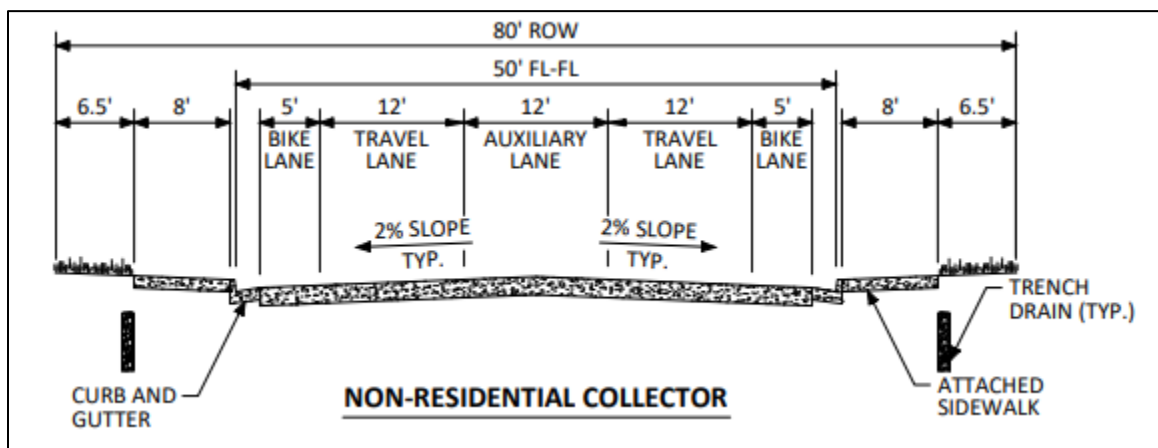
Parker's Non-Residential Collector Roadway Cross Section
